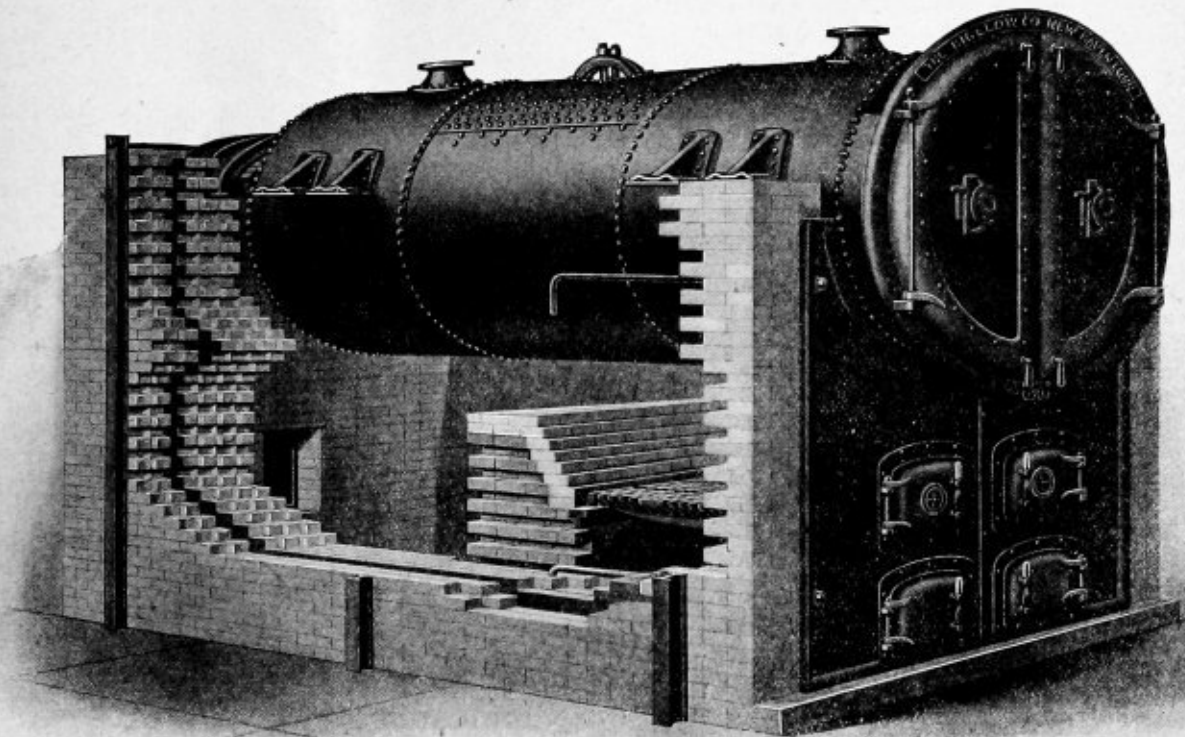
Sectional View of Horizontal Return Tubular Boiler Setting Designed by The Bigelow Company, New Haven, Conn.
